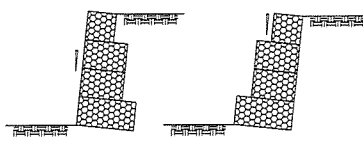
TYPICAL CROSS SECTION OF GABION WALL
